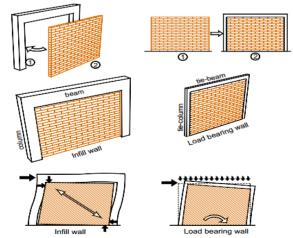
(a) reinforced concrete frame. 1(b) confined masonry
